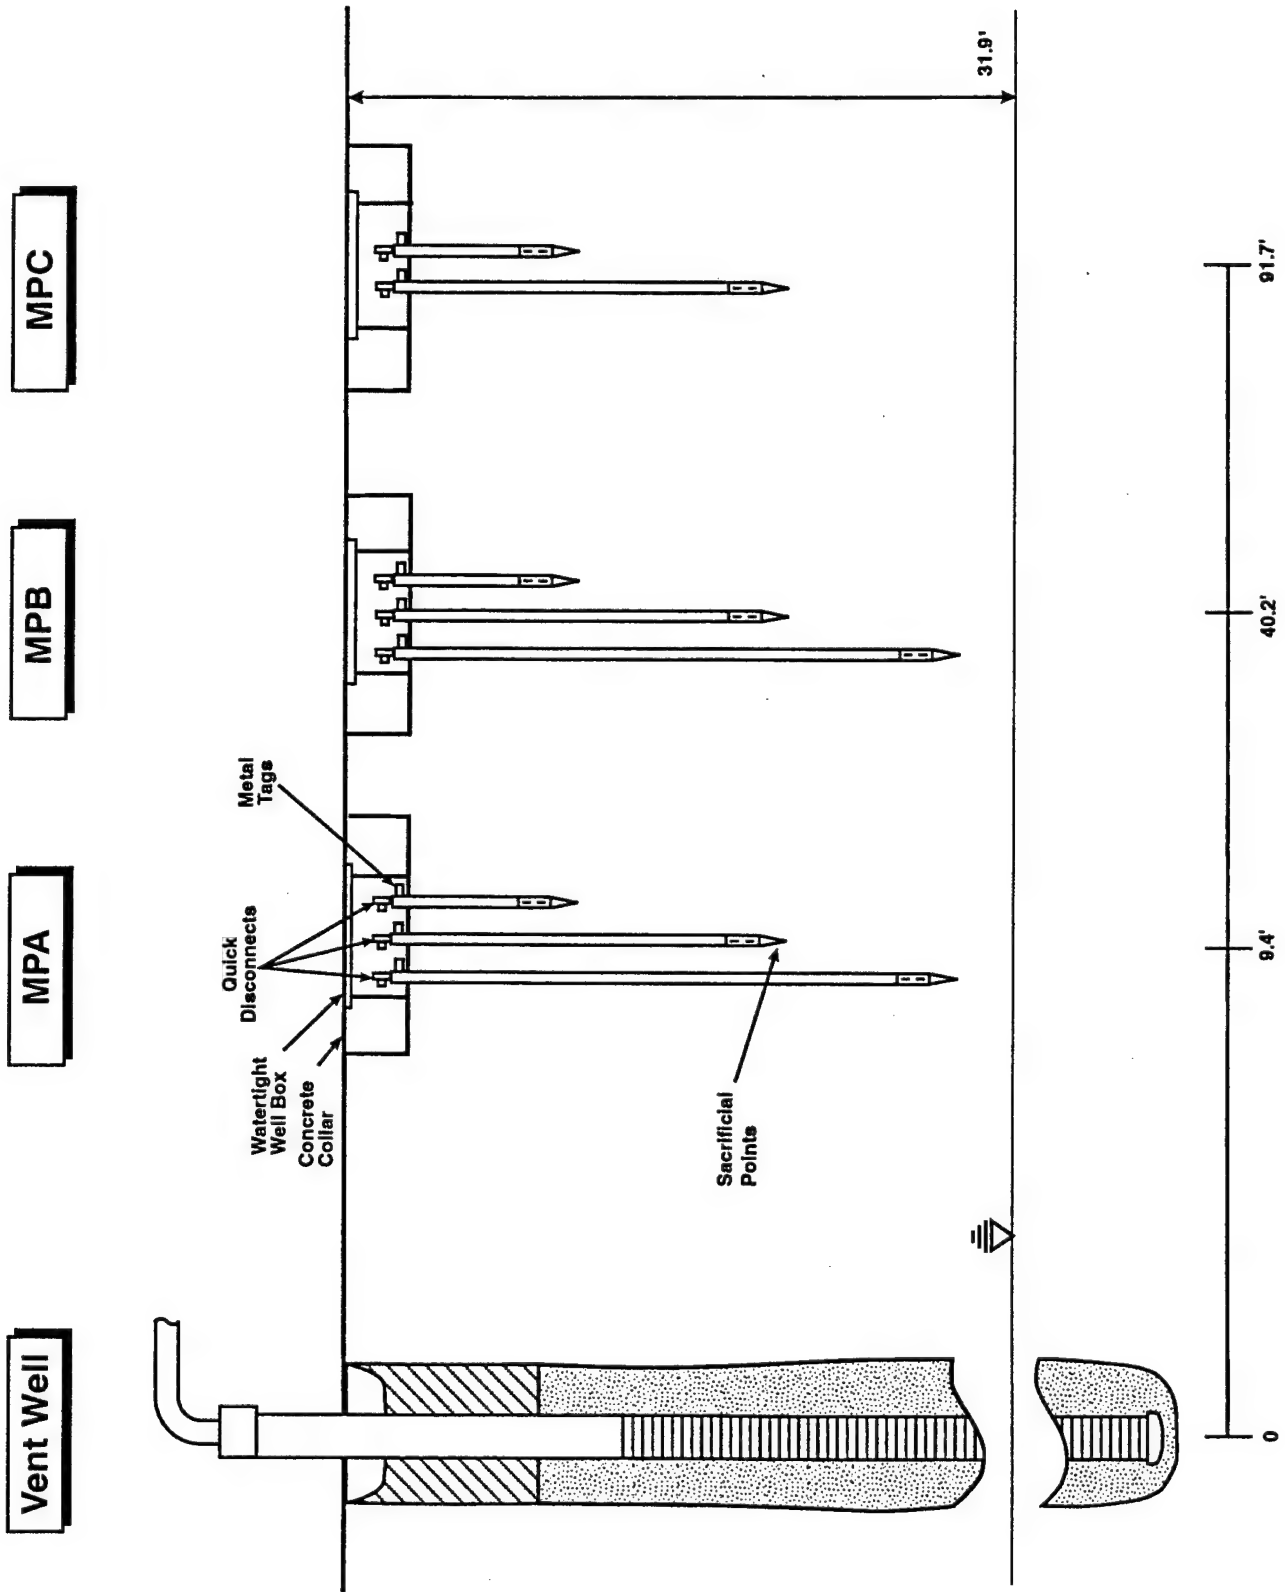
Cross Section of Vent Well and Monitoring Points at the Million Gallon Hill Site Showing Site Lithology and Construction Detail (not to scale)
